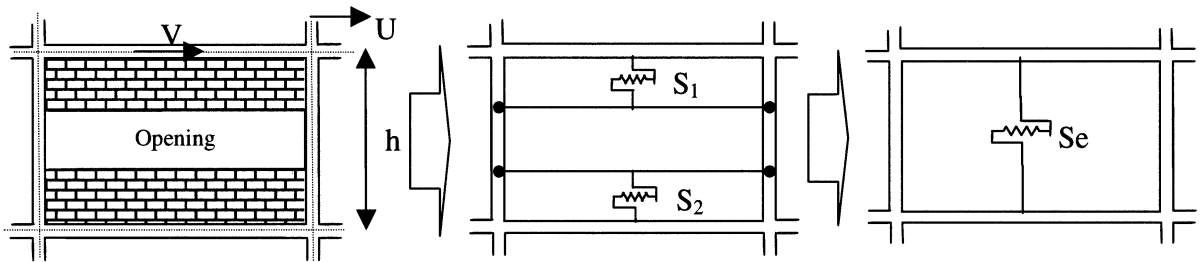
b. Infill masonry walls with one mid-full-opening Type C.
